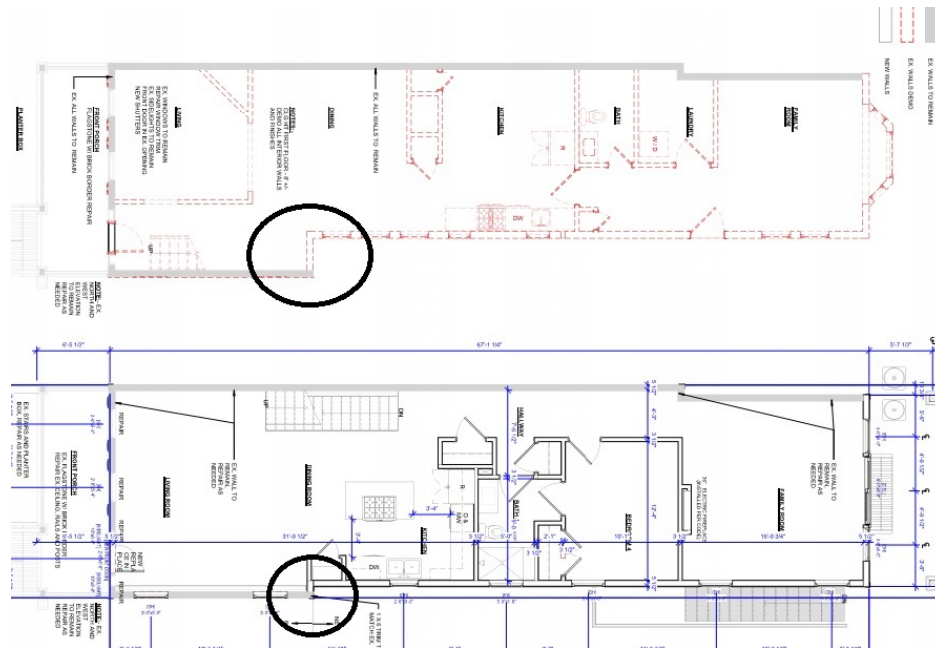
Existing floor plan top, proposed below. Black circle indicates shift in south ell wall location
